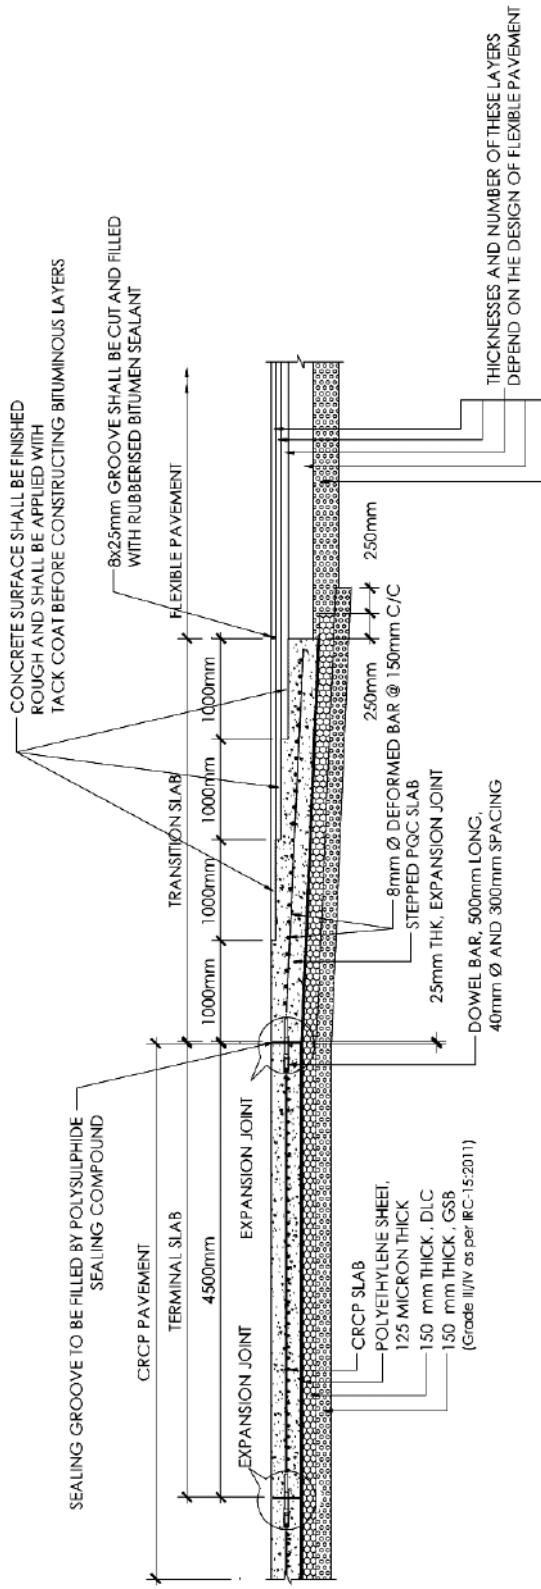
A Typical Details of Stepped Concrete Transition Slab Provided between CRCP and Flexible Pavement
